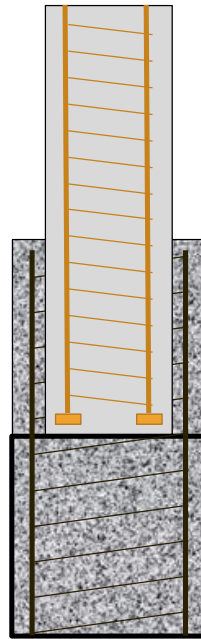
Precast column to precast shaft connection with CIP sleeve in Washington State
